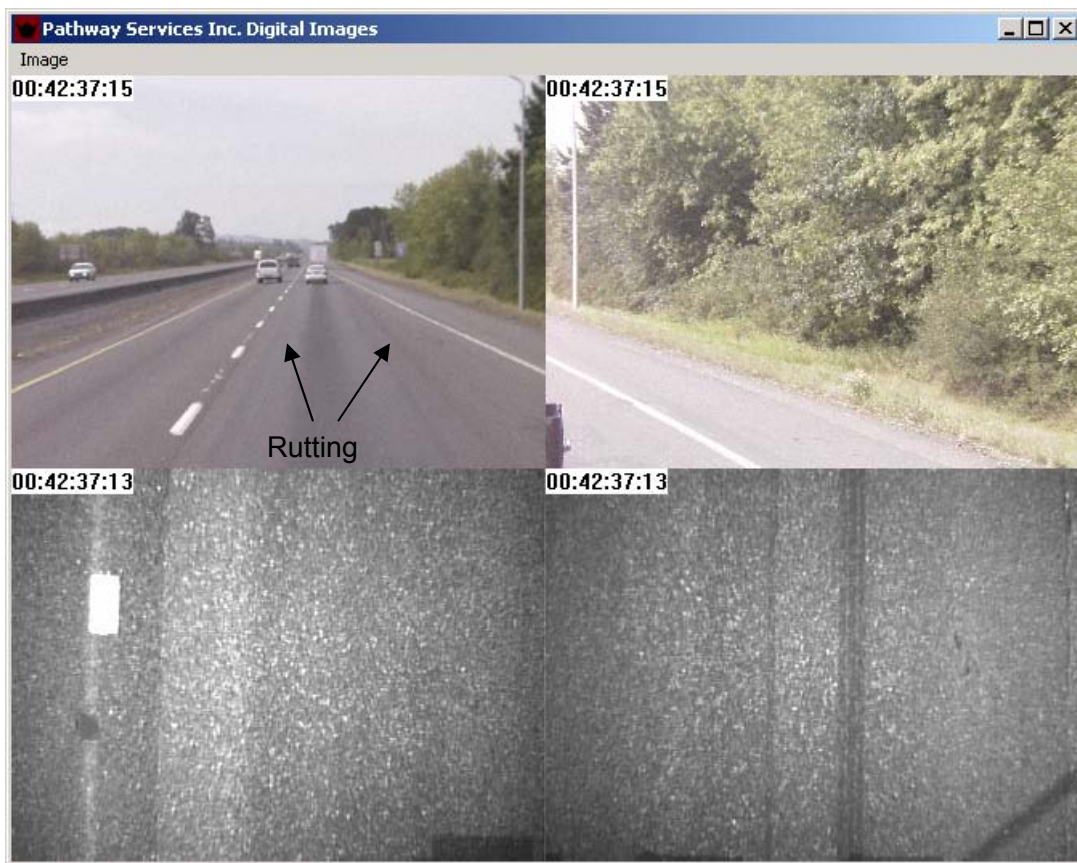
Pavement view in location of rutting (I-5, southbound, milepost 63.00, Toledo vicinity, hot mix asphalt pavement).
